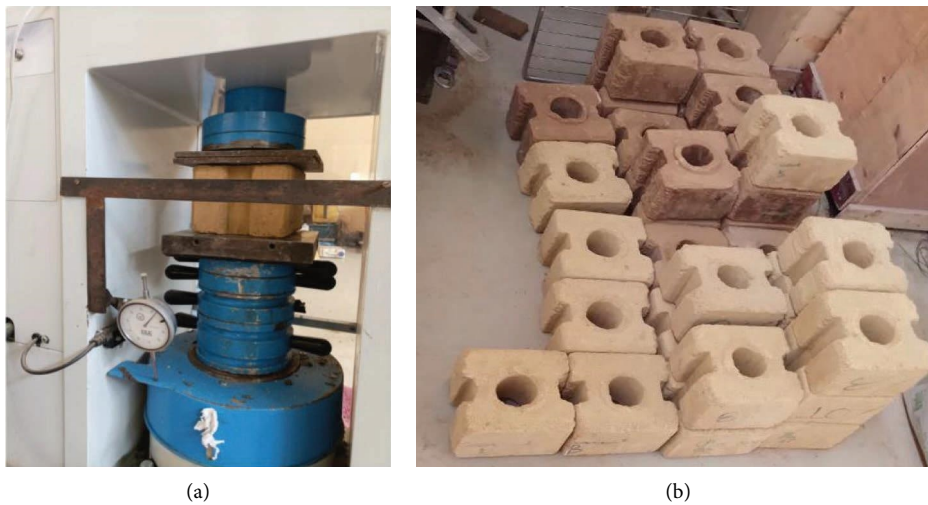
(a) Compressive test set up and (b) test specimen.
